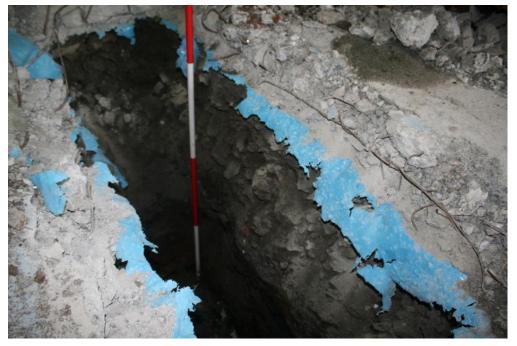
View northwest of Test Pit 8. 1 x 2m scale.
